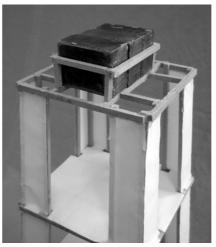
An example of a model with 4 floors. The top floor is a flat roof. The ground floor is on the base board.
